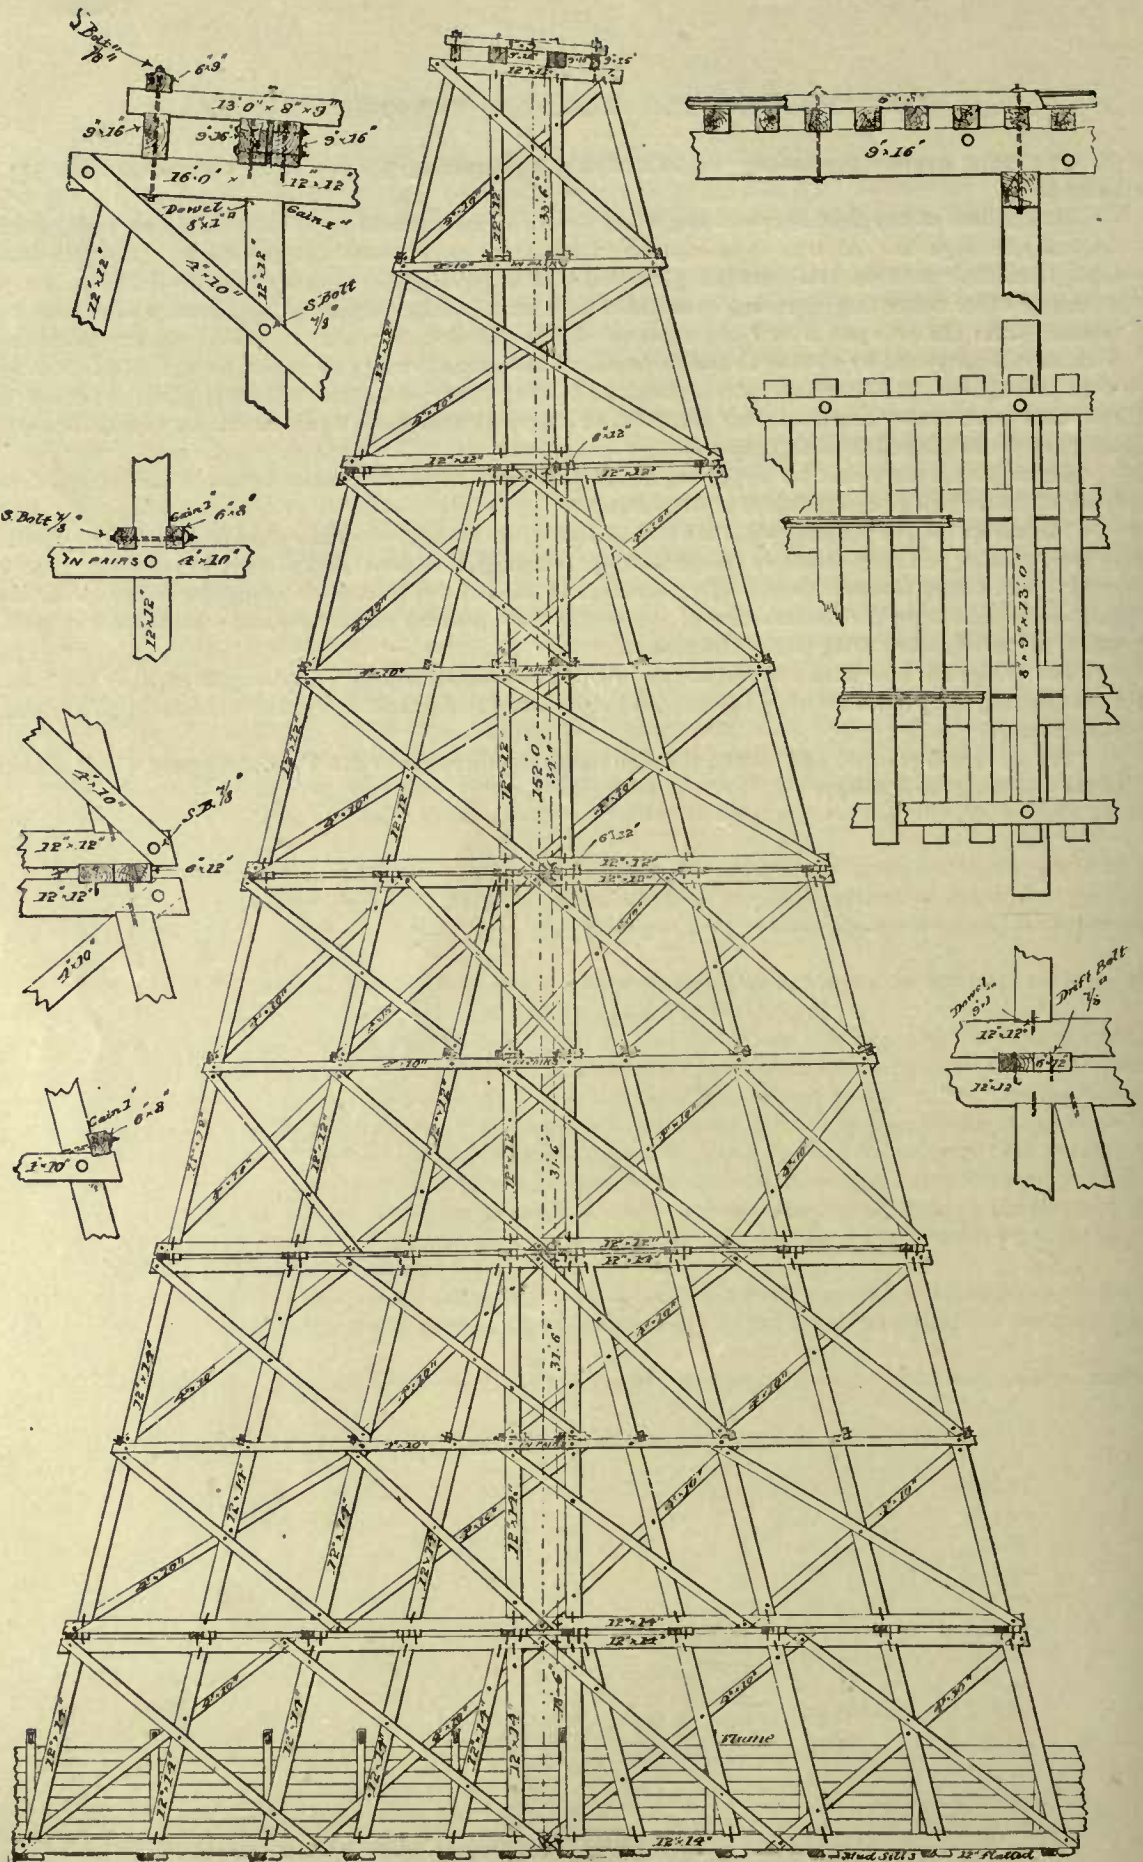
PLATE XXXVIII.—STANDARD FRAMED TRESTLE, ESQUIMALT & NANAIMO RAILWAY.
